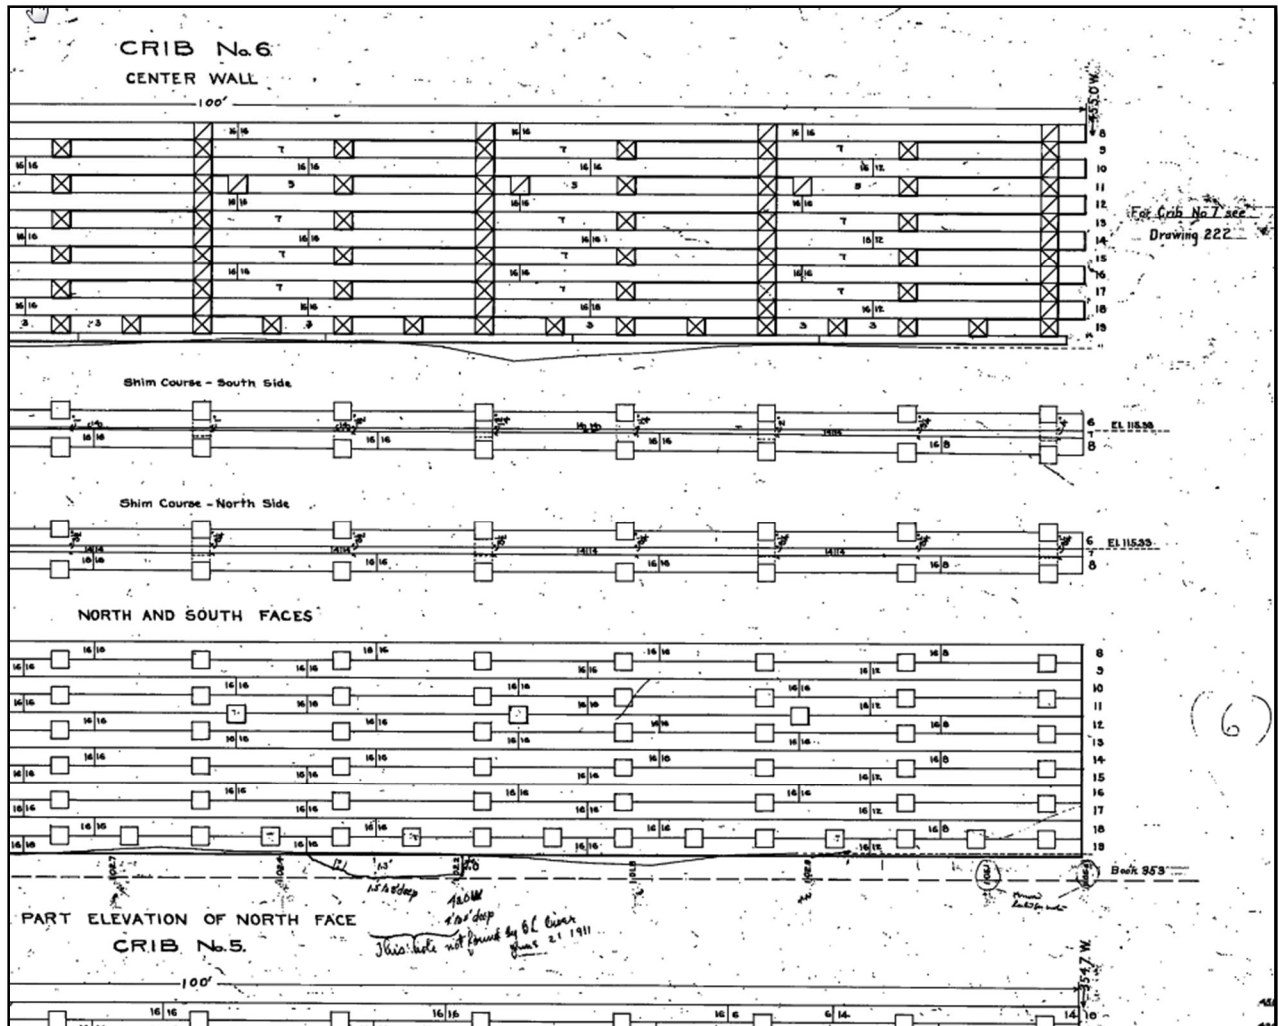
1906 WCP Crib Drawings – Crib 6 Detail
